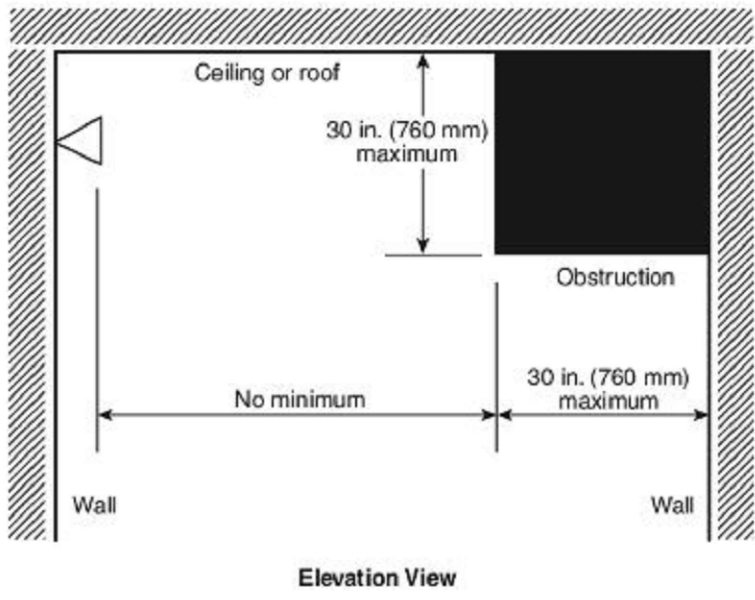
(c) Positioning of Sprinkler to Avoid Obstruction Against Wall (Residential Sidewall Sprinklers).
